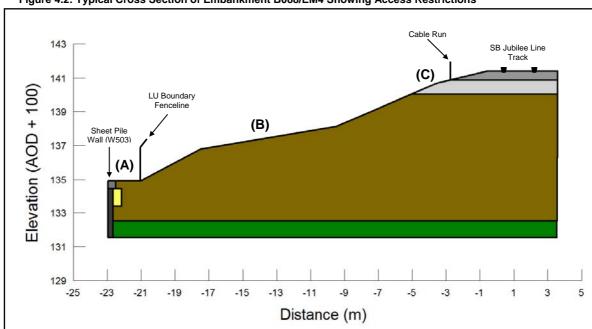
Typical Cross Section of Embankment B088/EM4 Showing Access Restrictions
